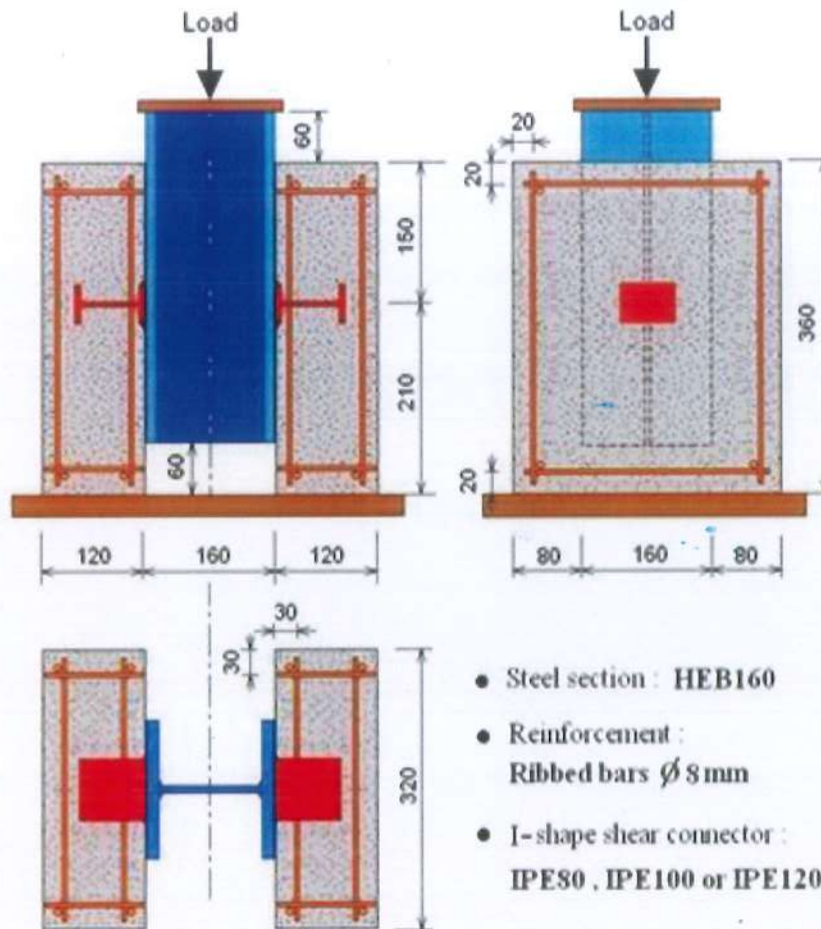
Push-Out Specimen with I-shape Connector (Dimensions in mm) [27].
